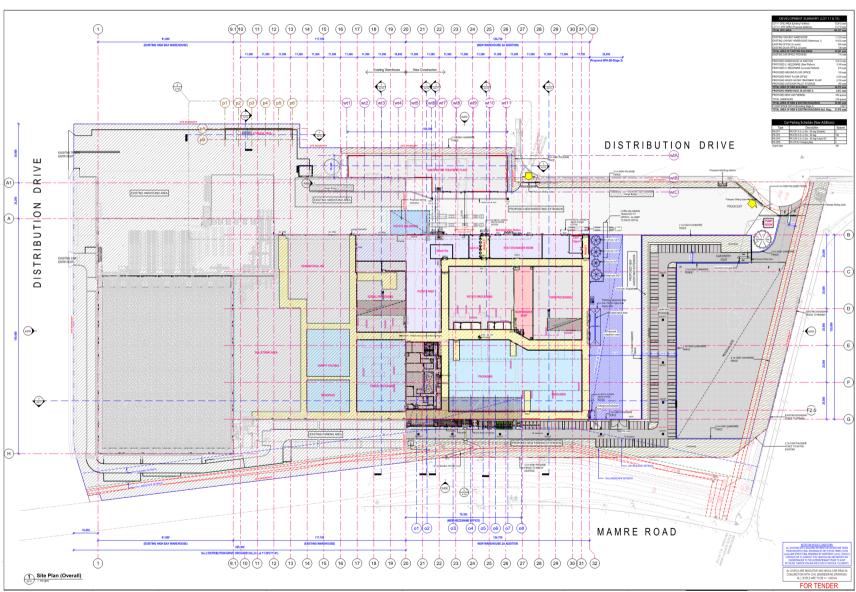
Proposed Site Plan (Source: HLA Architects, 2021)
